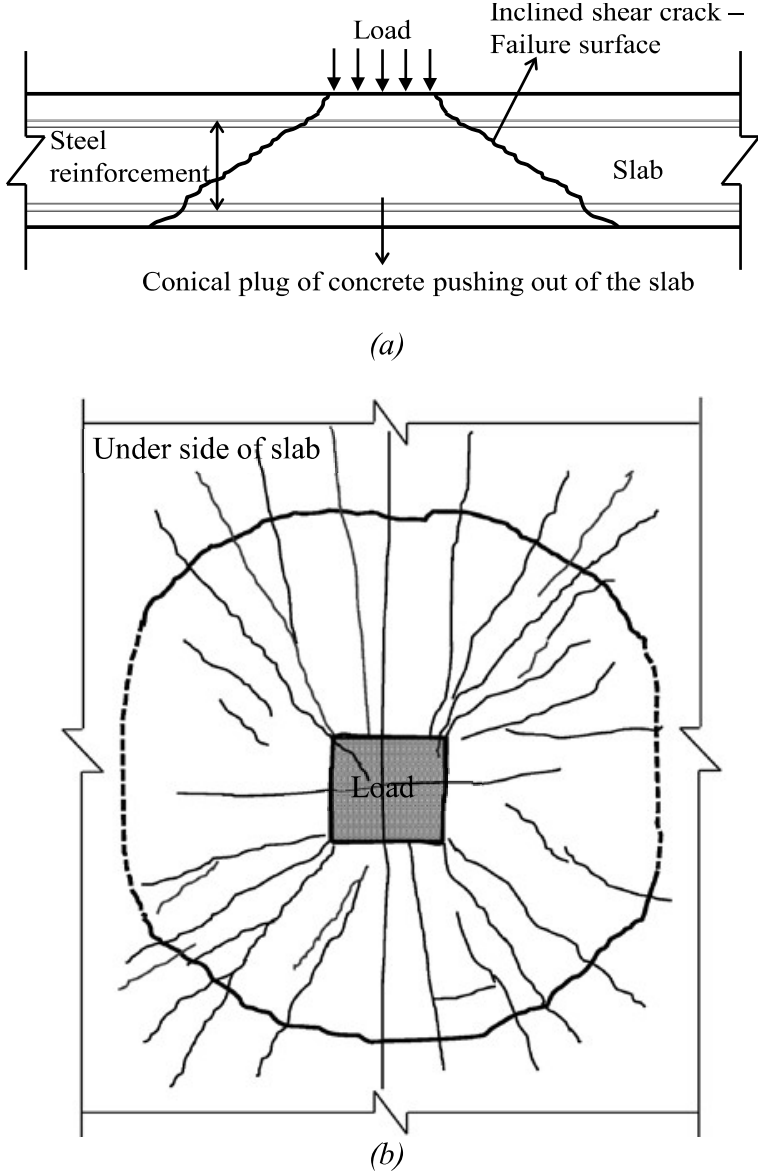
Typical punching shear cracking pattern: a) Punching shear cone in cross section; b) Crack pattern in plan. [2]
